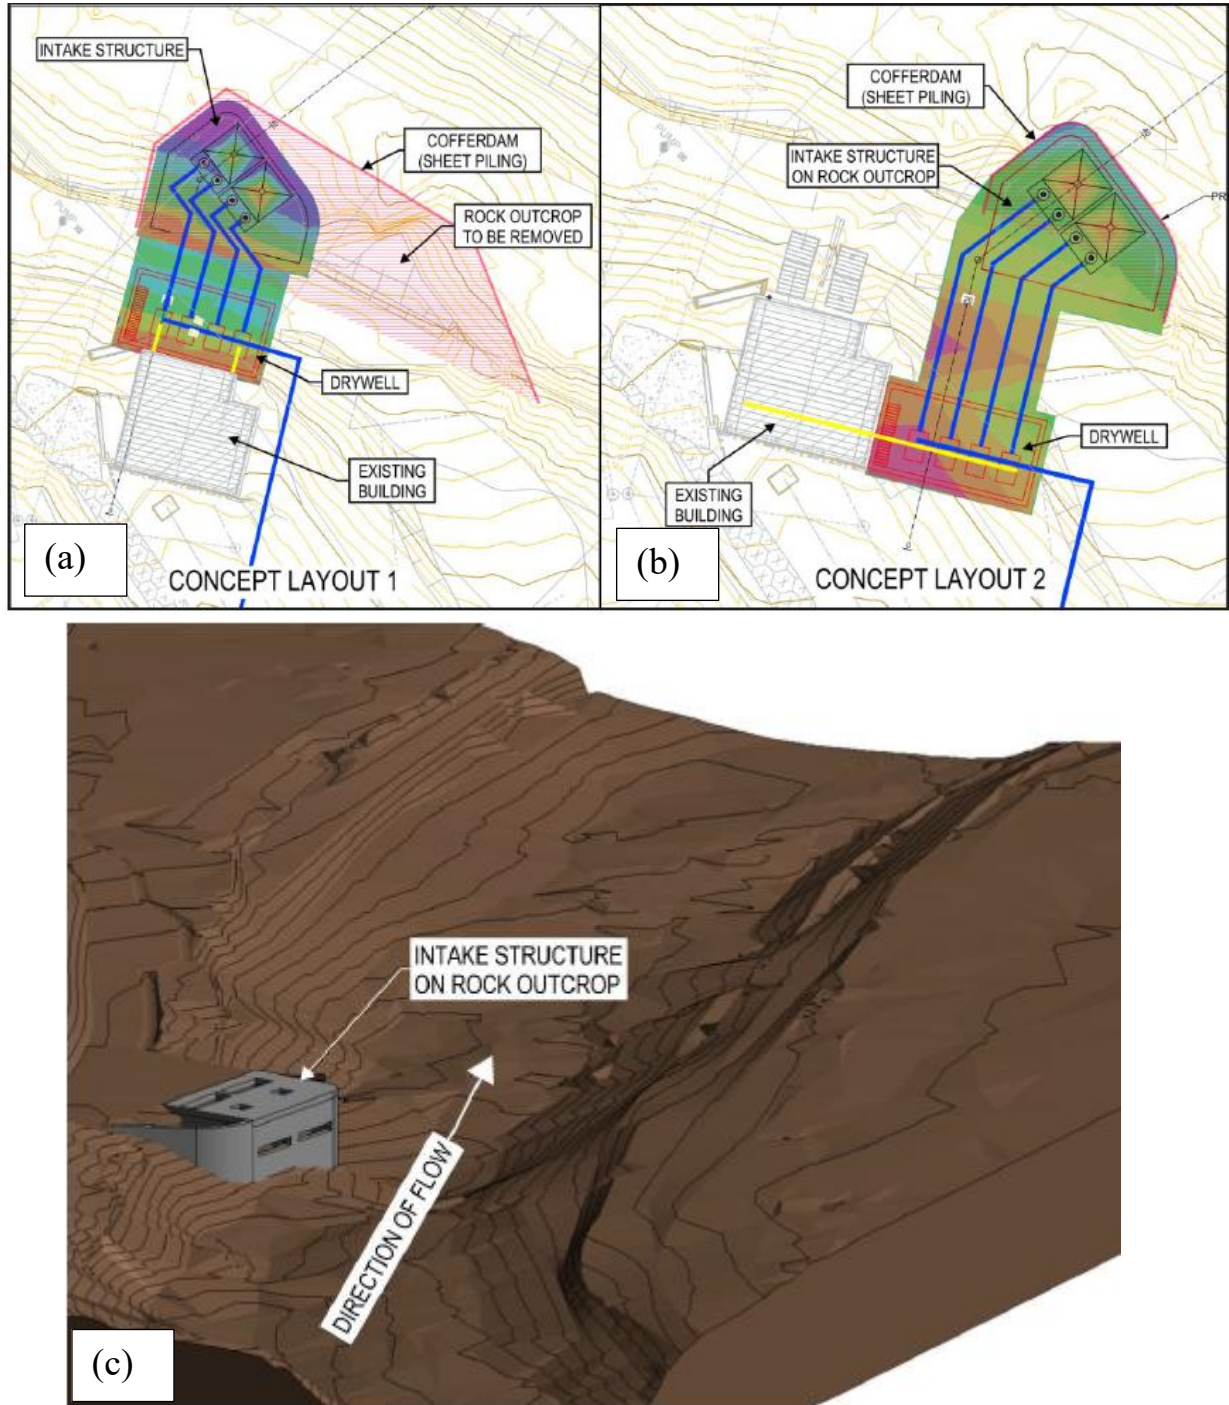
Site layout plan showing the proposed abstraction point designs (a) and (b), as well as a 3D design of the river bed showing location of inlet structure on top of existing bedrock (c).
